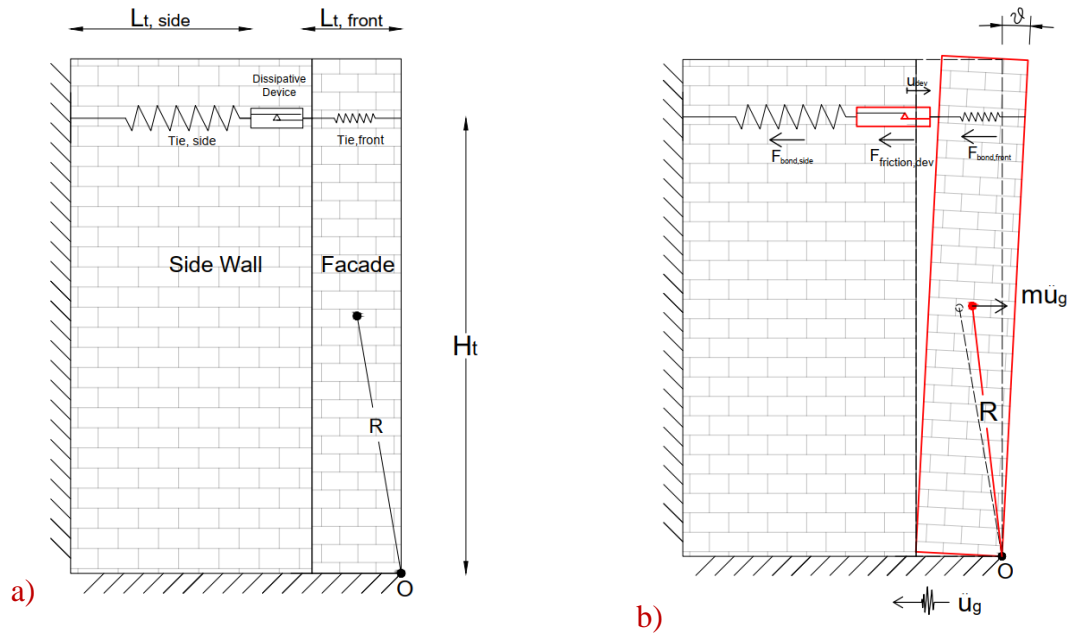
a) Corner connection strengthened by dissipative anchoring system (James et al. 2011): a) resting position of the wall, b) tilted configuration of the wall due to base acceleration and activation of the device.
